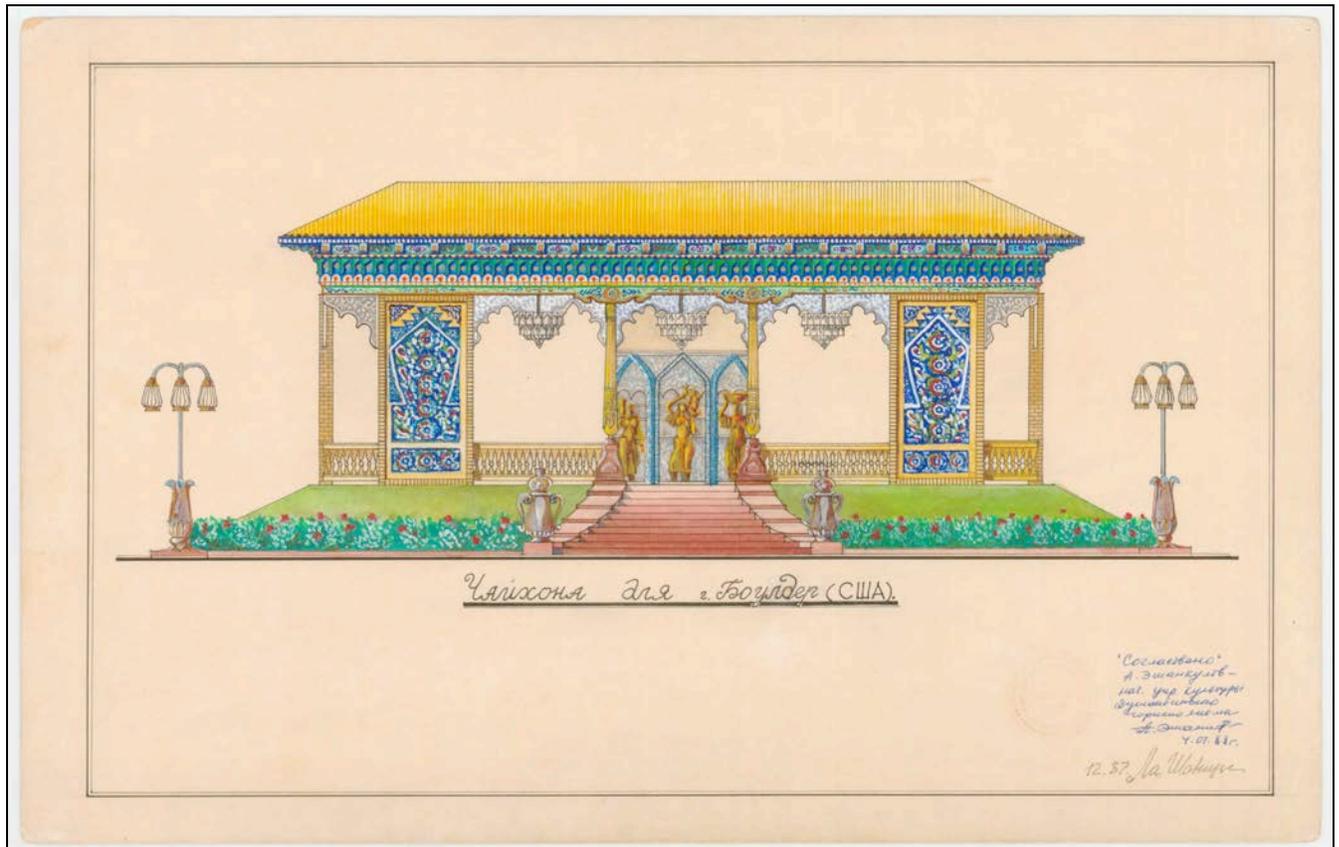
Boulder-Dushanbe Teahouse: Original Front Elevation, Lado Shanidze, 1988
